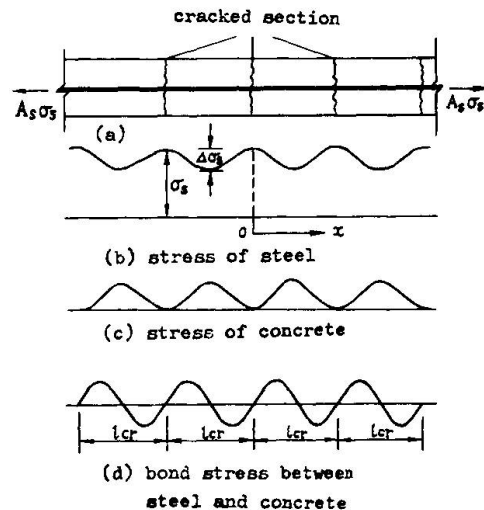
Distribution diagram of steel stress, concrete stress and bond stress between two adjacent cracked sections
